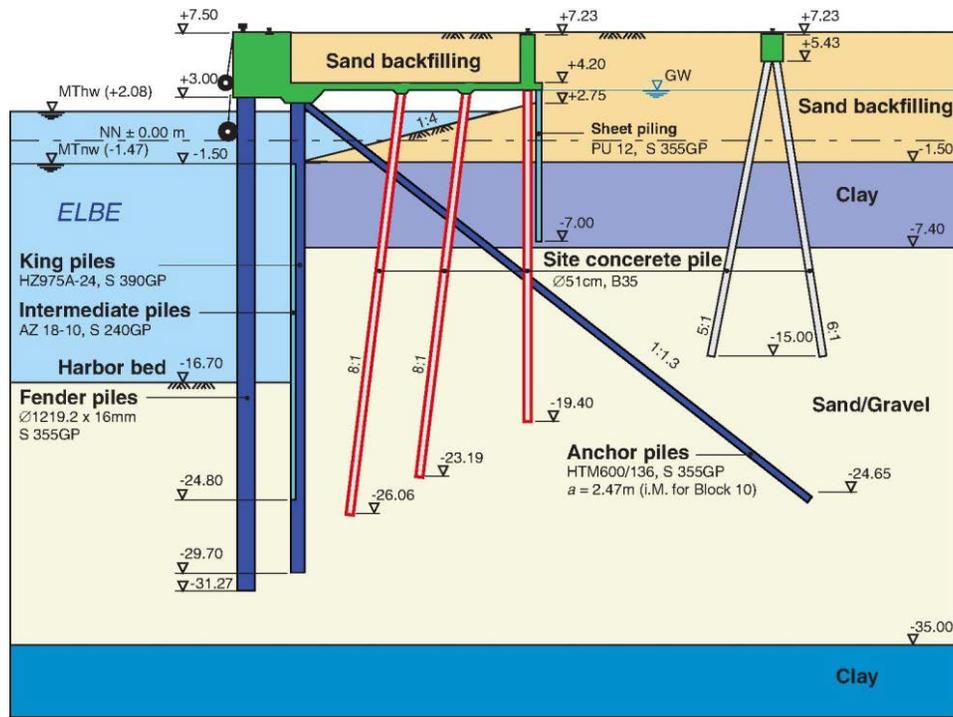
Section of the quay structure Containerterminal Alterwerder (CTA) in Hamburg, Germany [1]
